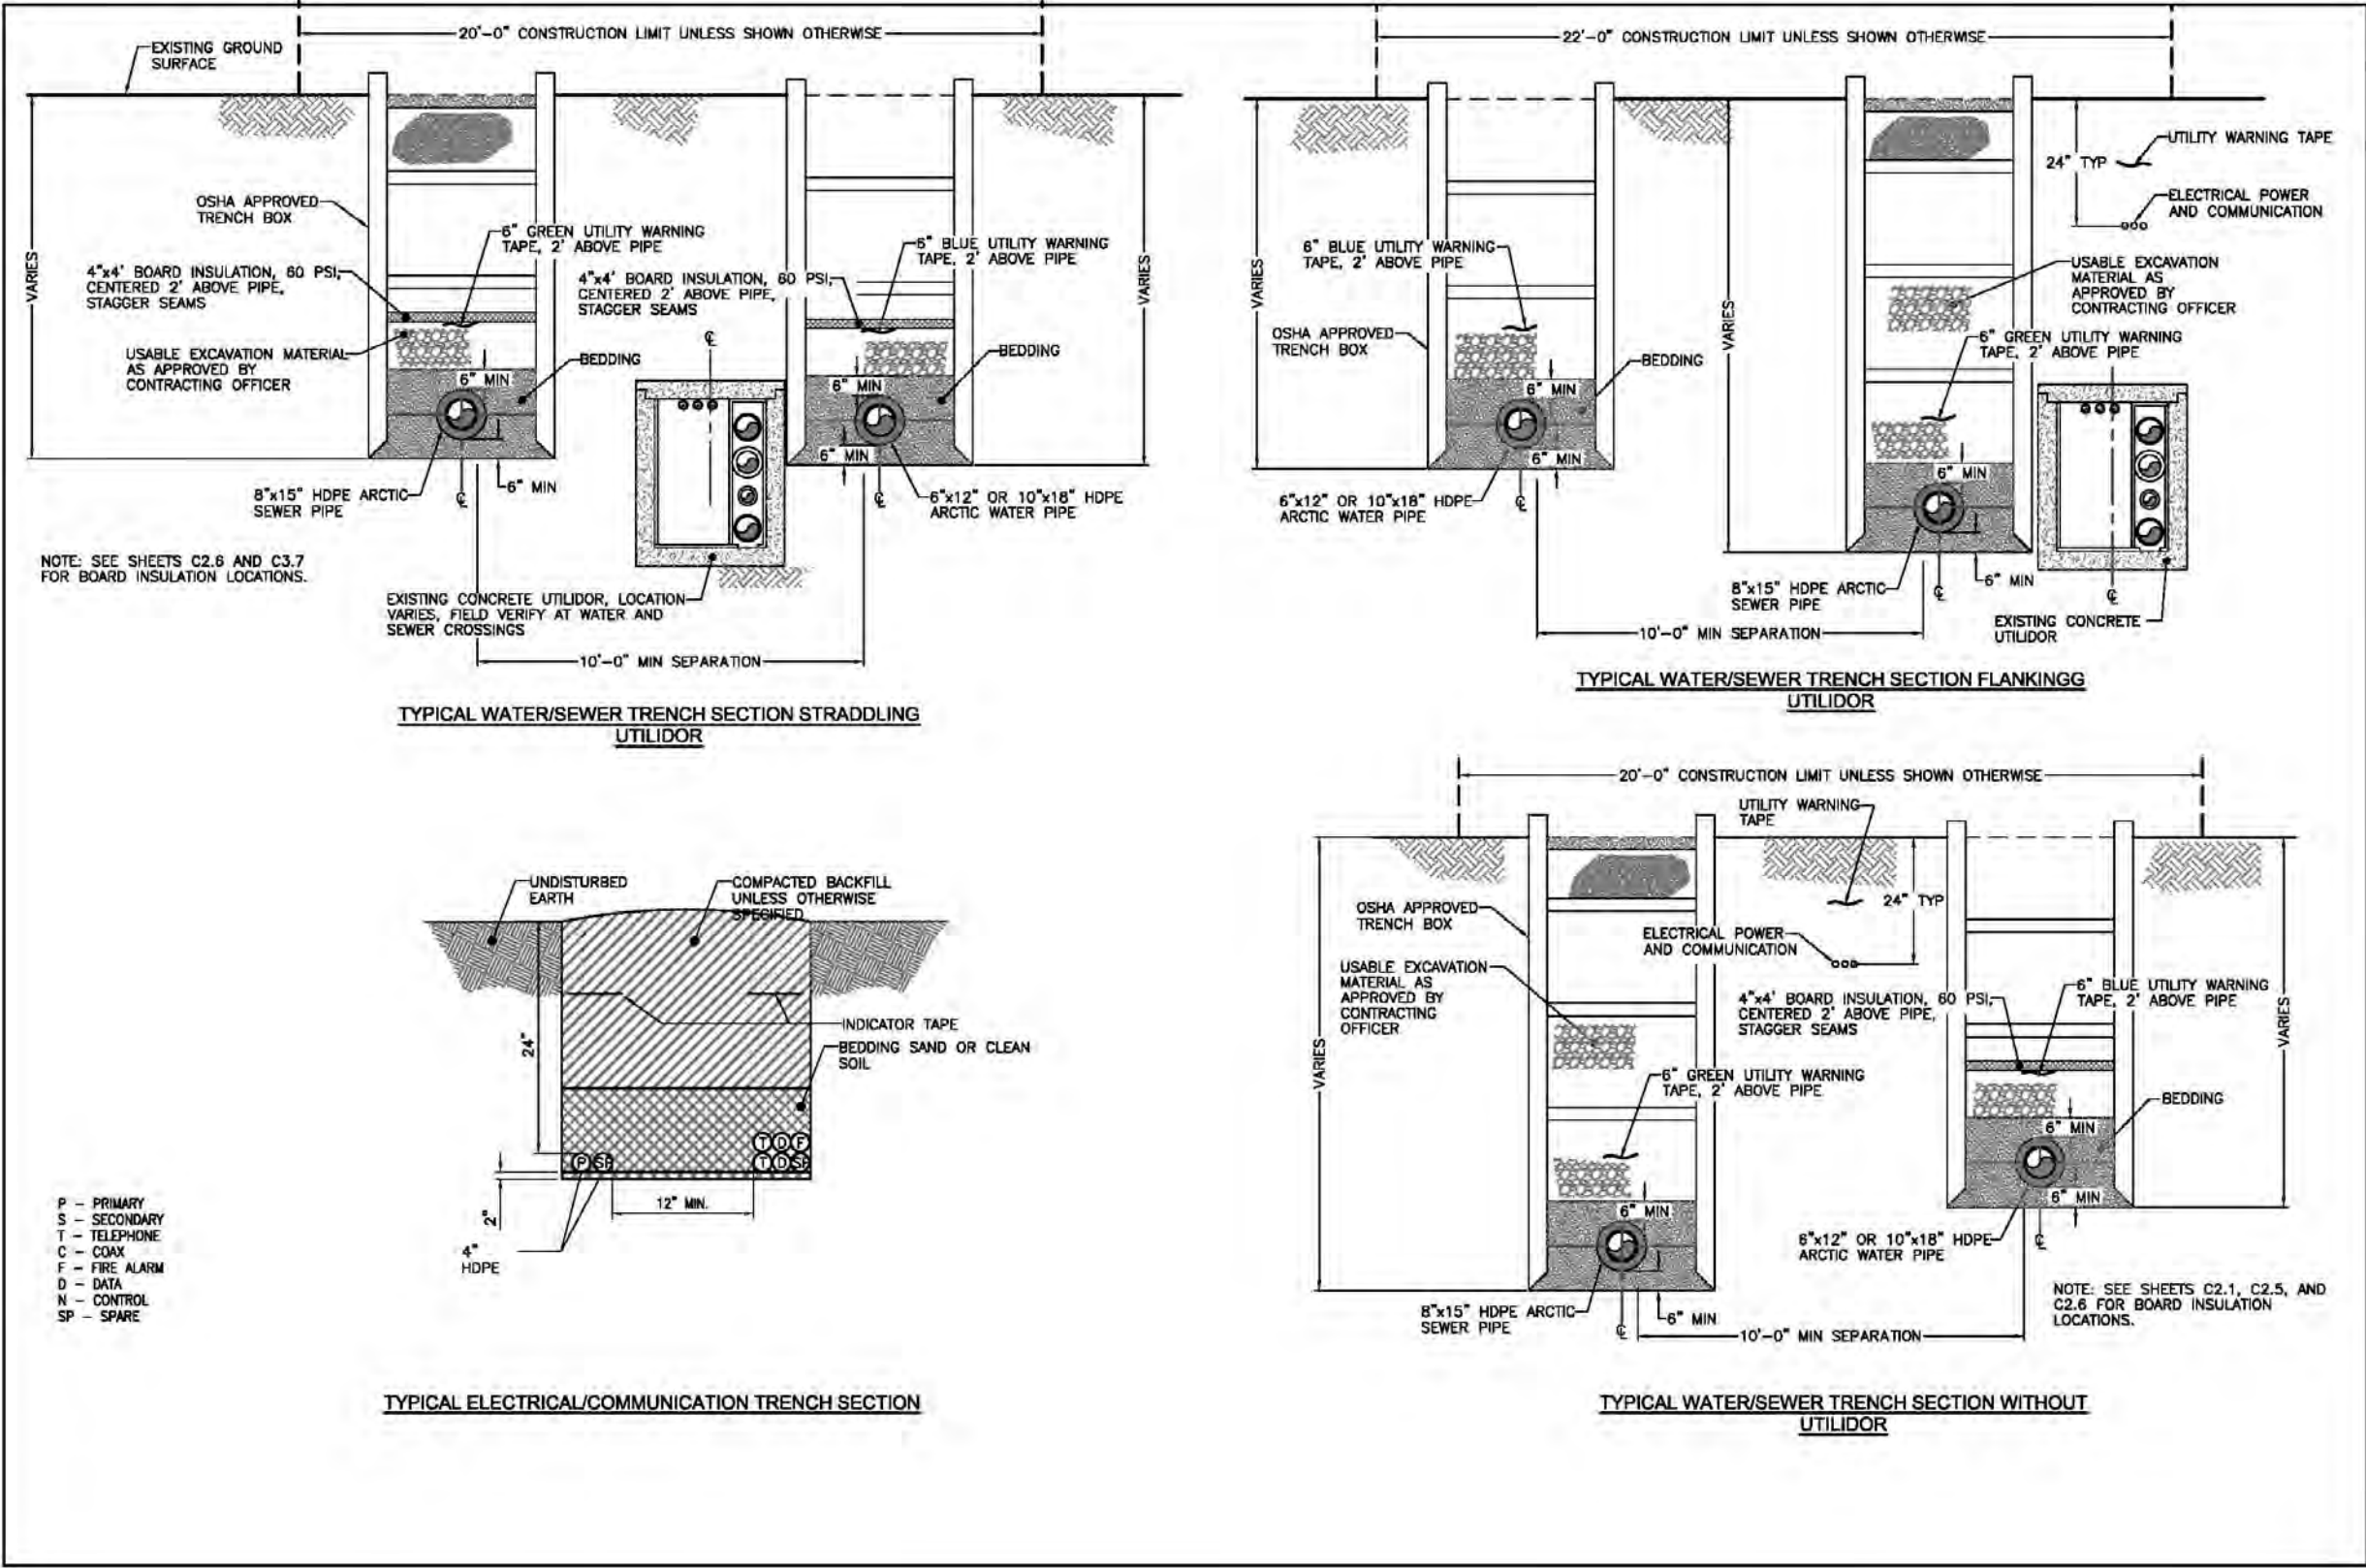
Alternative B (Preferred Alternative) Utilities Trench Cross Sections
